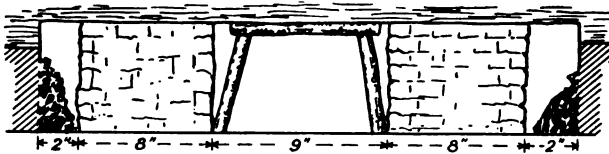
Support of a Haulage Road, showing Side Packs and Wastage Spaces.
